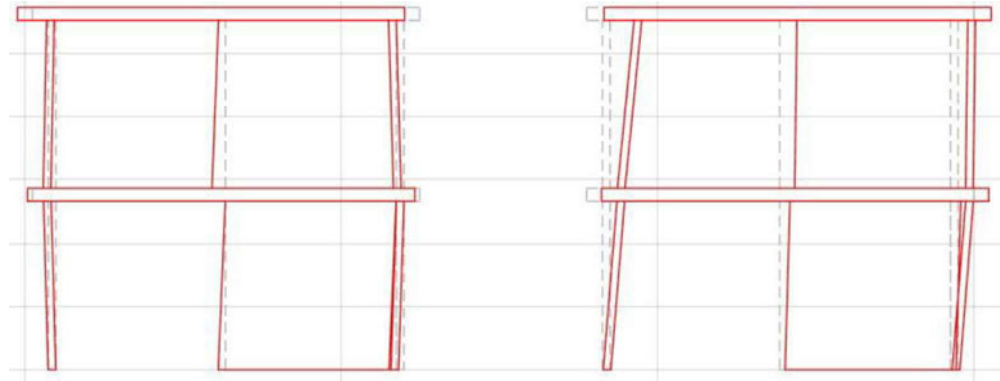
Deformed shape of EUC-BUILD5 specimen (max and min) – Test run #8; adapted from [Brunesi et al, 2017b].
